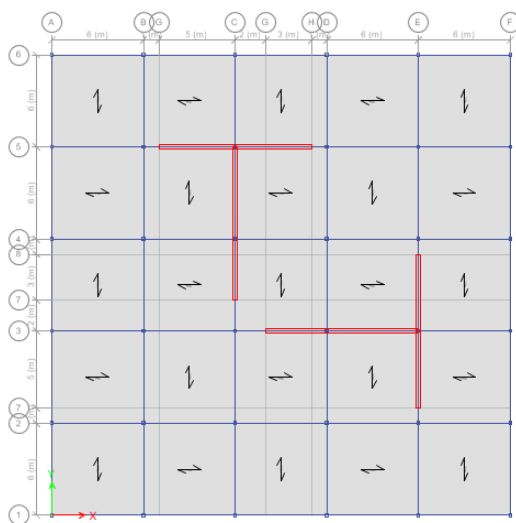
illustrates the layout of T-shaped and \perp -shaped shear walls in the floor plans of the 10-, 20-, and 30-story buildings. For the 10-story building, the thickness of the shear wall in all floors is 30 cm. In the 20-story building, the thickness of the shear wall is 40 cm for the lower 10 floors and 30 cm for the upper 10 floors. In the 30-story building, the thickness of the shear wall is 50 cm for the lower 10 floors, 40 cm for the middle 10 floors, and 30 cm for the upper 10 floors.
